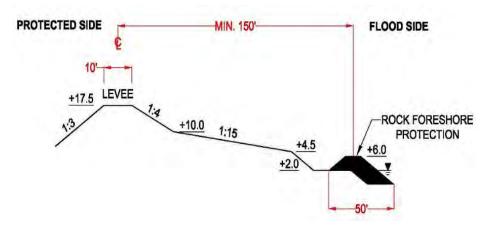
Typical Construction of Levee and Foreshore Protection
